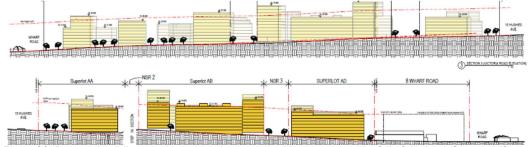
Proposed building envelopes have been stepped in response to the fall of the land (Source: AJC)
